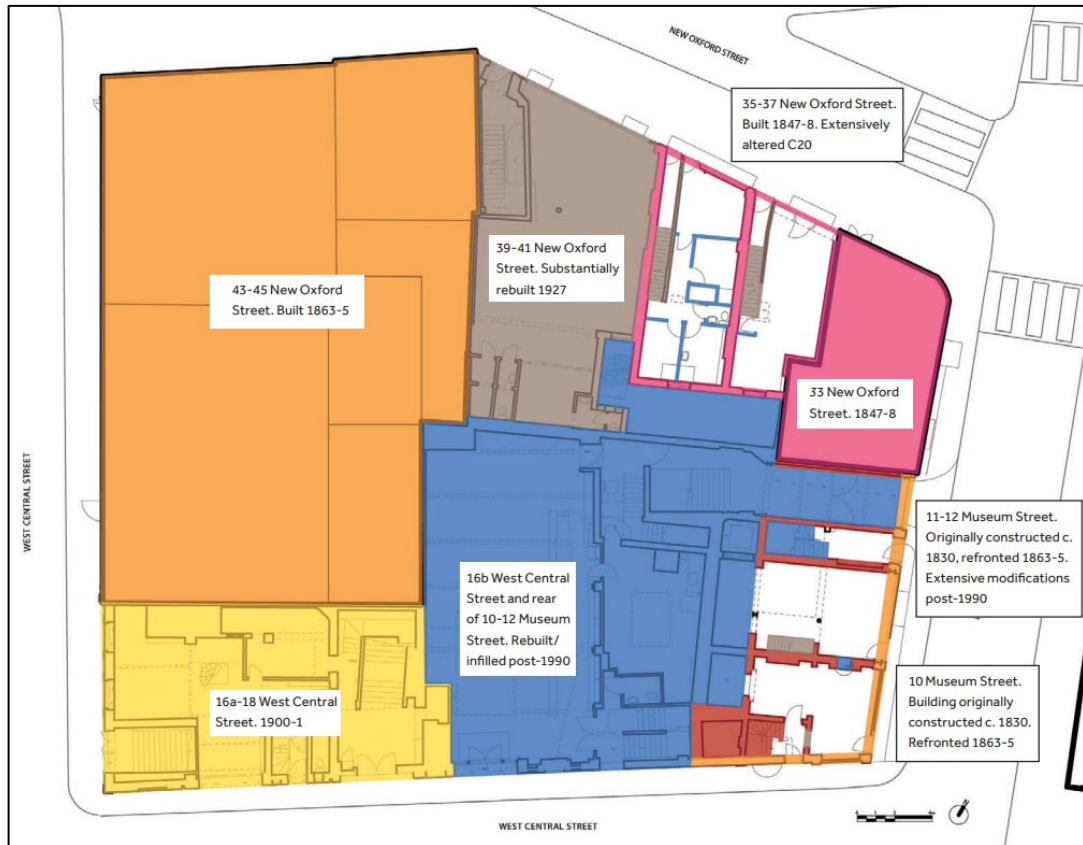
West Central Street overview (note: 43-45 New Oxford St and 33 New Oxford Street are outside of the planning application scope)
